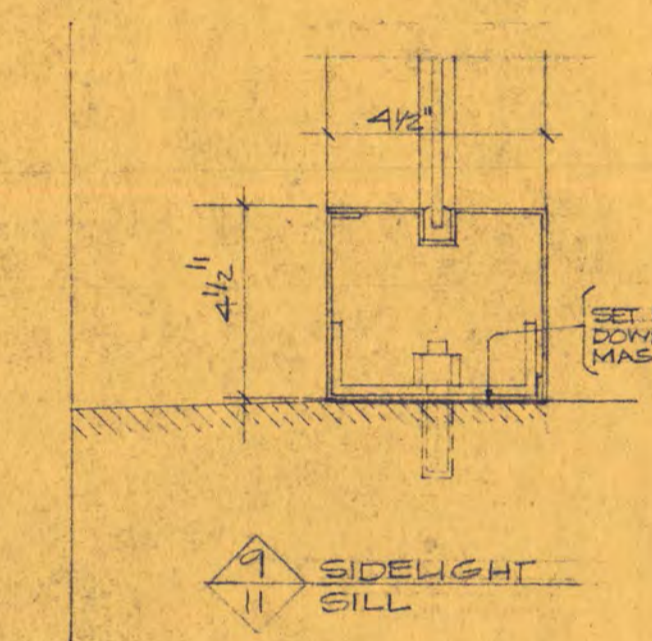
DETAILS - ALUM. HORIZ. SLIDING WINDOWS SCALE 3" = 1'-0"
